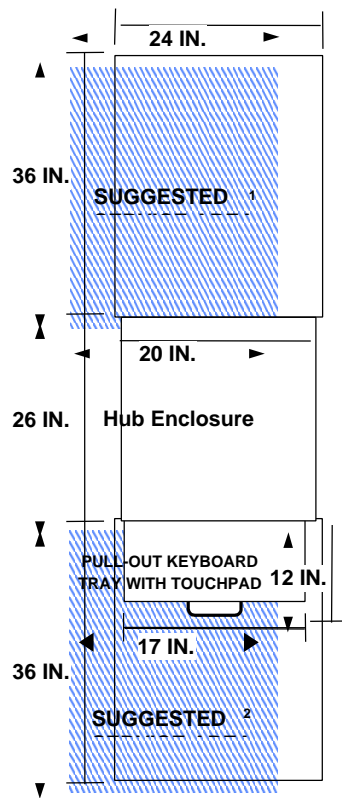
shows the suggested floor space to support the Indoor Hub Equipment enclosure installation, operator workspace, and service area.
